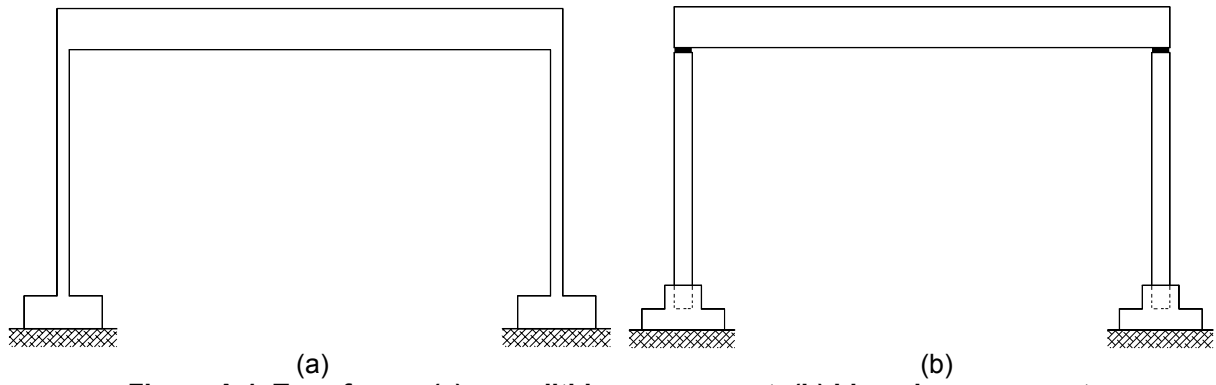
Type frame: (a) monolithic arrangement; (b) hinged arrangement.
